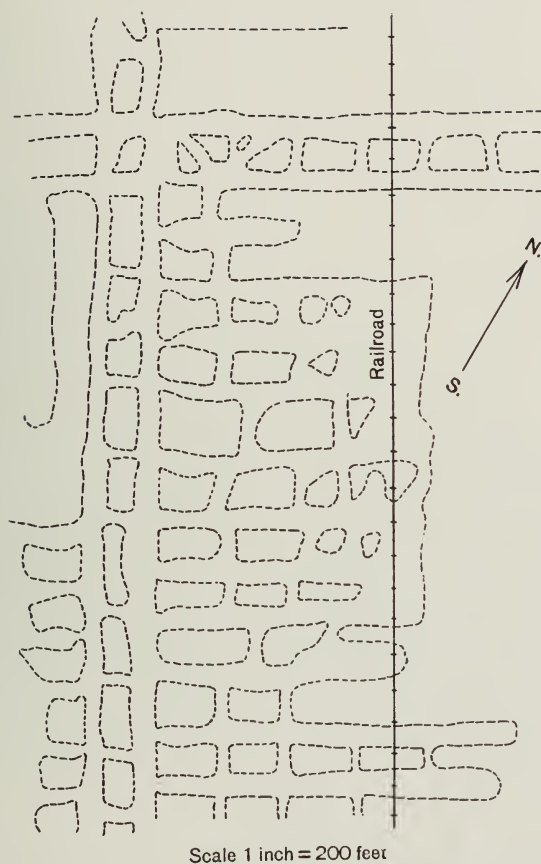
Plan showing relation of railroad in figure 38 to mine workings.
